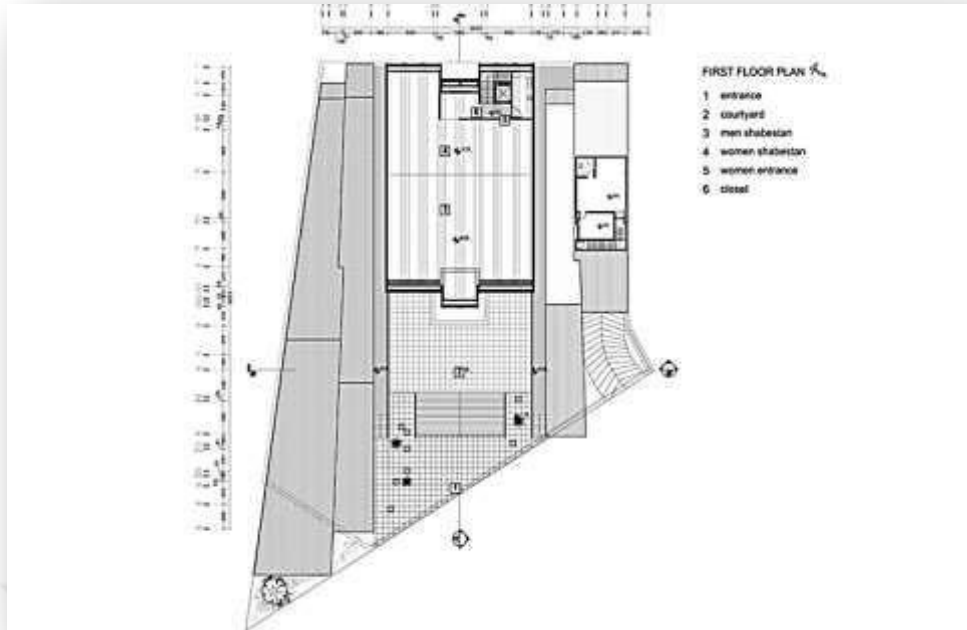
First Floor Plan. Kalout Architect Studio, 2012, Retrieved from <https://kaloutarch.com/>
